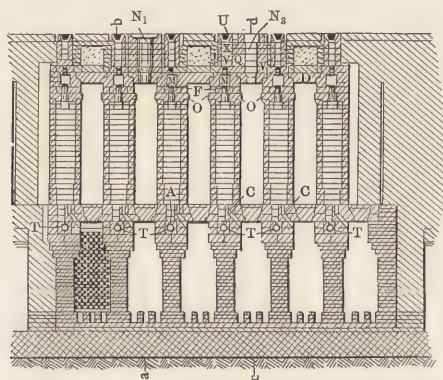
CROSS-SECTION THROUGH KOPPER'S OVEN.
